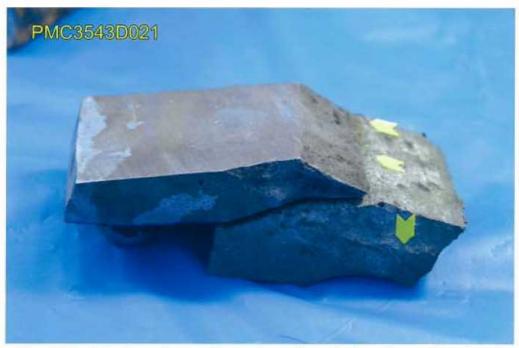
Inside diameter surface of eye bar pin location, after cleaning of oxide layer.
